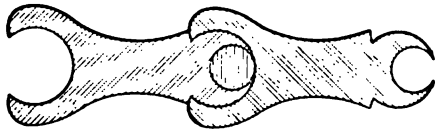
BEHREND'S STEEL SHEET-PILING.
